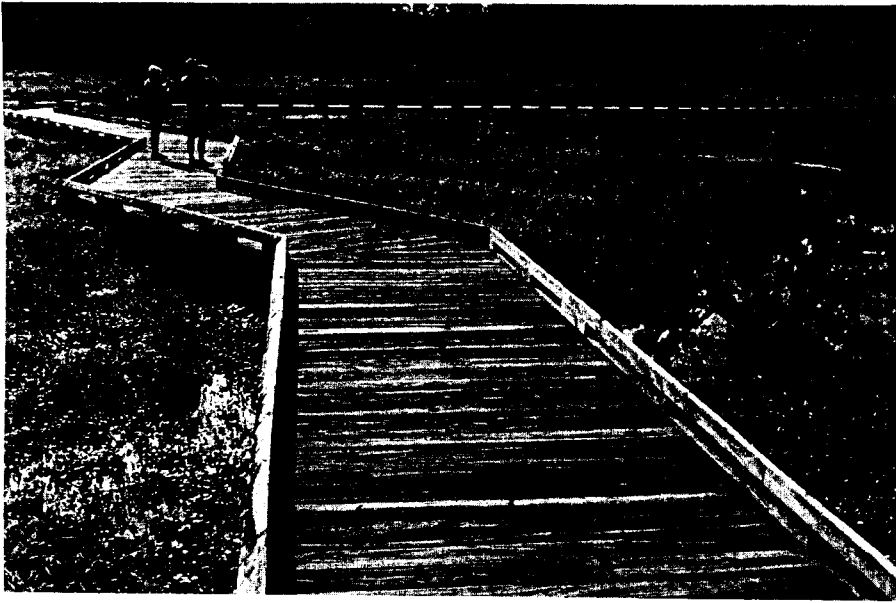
shows a boardwalk crossing a fragile marsh ecosystem. A boardwalk is a porous surrogate for a pavement. It is supported by footings that touch the soil only at discrete points or lines. Because the decking surface is isolated from the ground, it preserves the dispersed flows of surface and subsurface waters. Water percolates through the decking without concentration and infiltrates native soil below. The continuous flows of water and sediment build ecological equilibrium, rebuild it with
